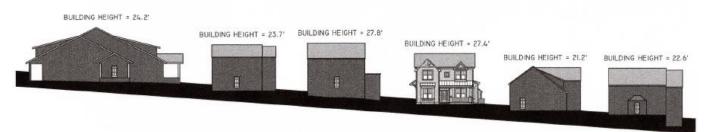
Rendering of proposed dwelling to compare massing with nearby existing dwellings as from Virginia Avenue
